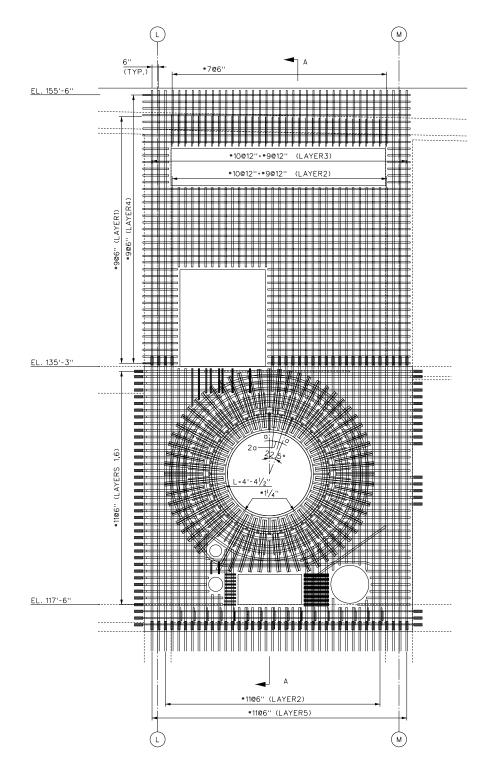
H.5-5 (Sheet 1 of 3) [Concrete Reinforcement in Wall 11]
